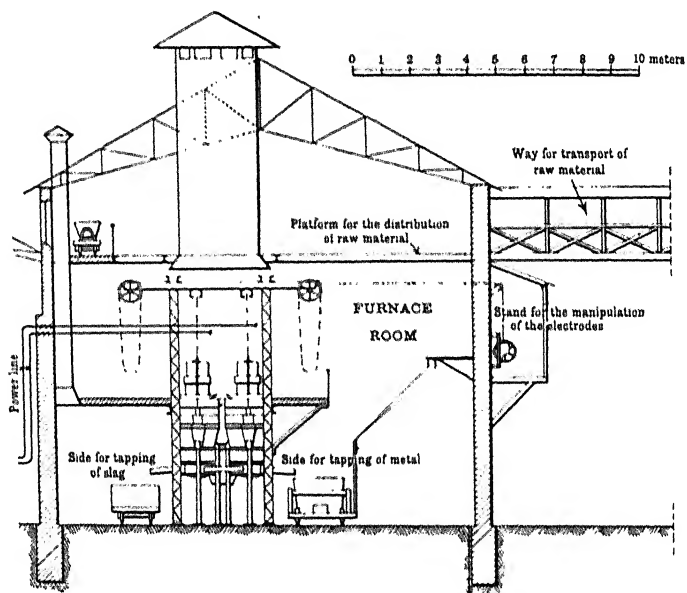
PROPOSED ARRANGEMENT OF KELLER FURNACE FOR PRODUCING 100 TONS OF PIG IRON IN 24 HOURS.
